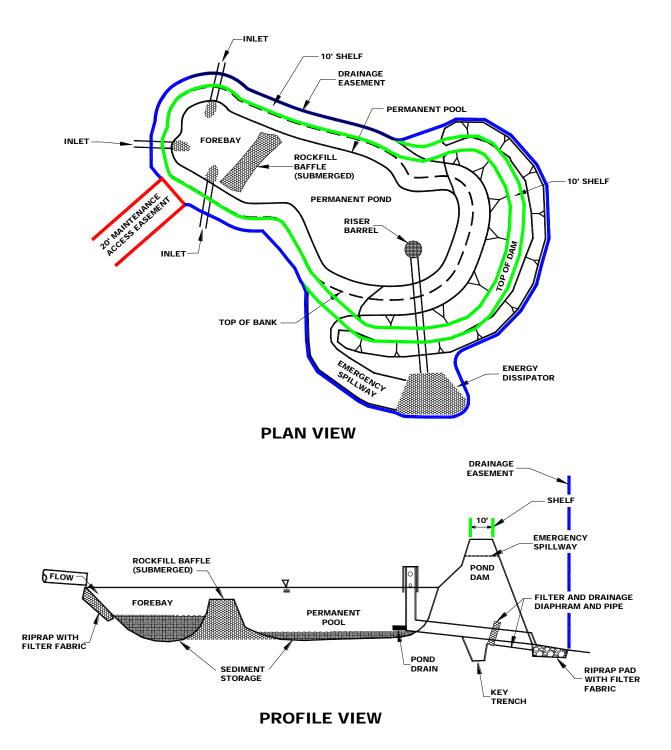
Example of Maintenance Access and Drainage Easements for a Wet Detention Pond
